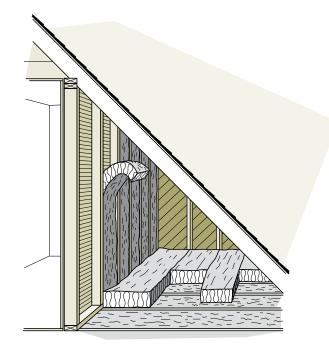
Rigid insulation can be nailed over the studs of the knee-wall section
